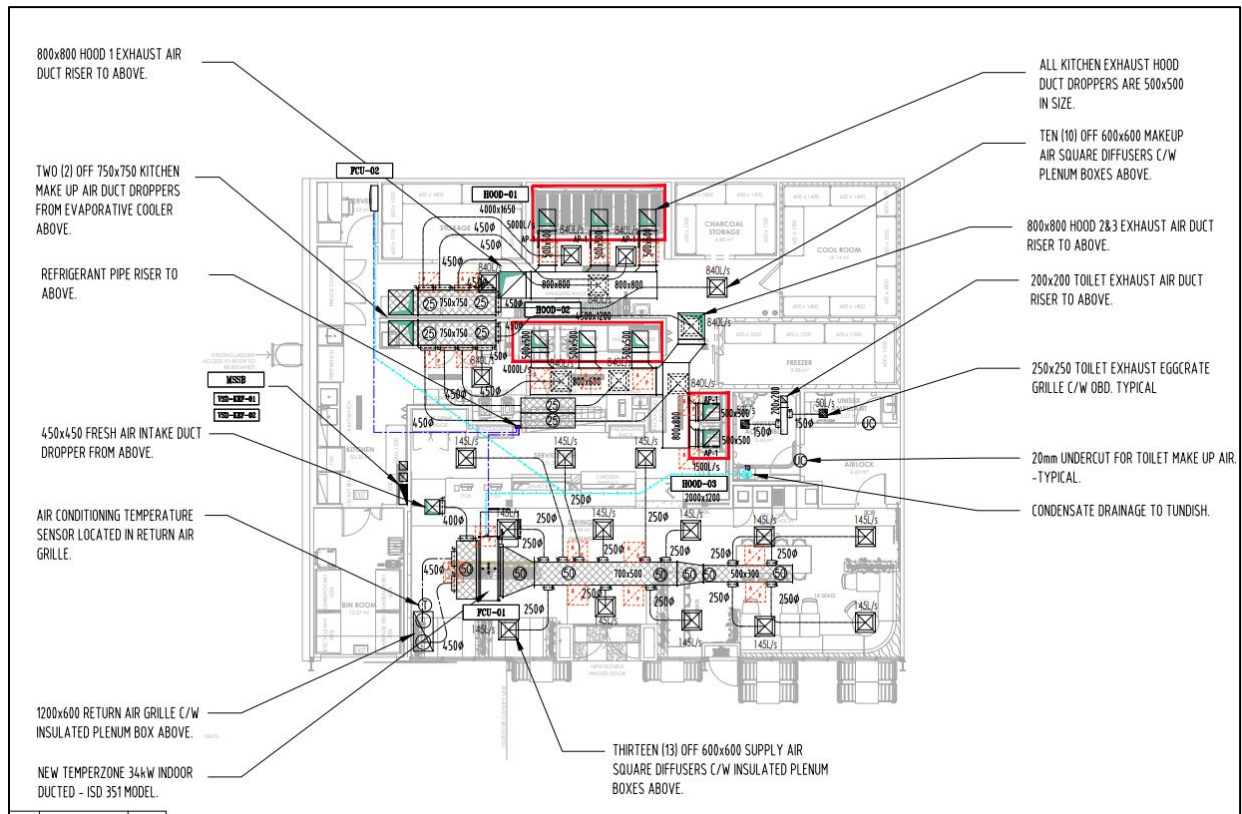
Proposed Charcoal Chicken Fume Hood Ground Floor Plan
